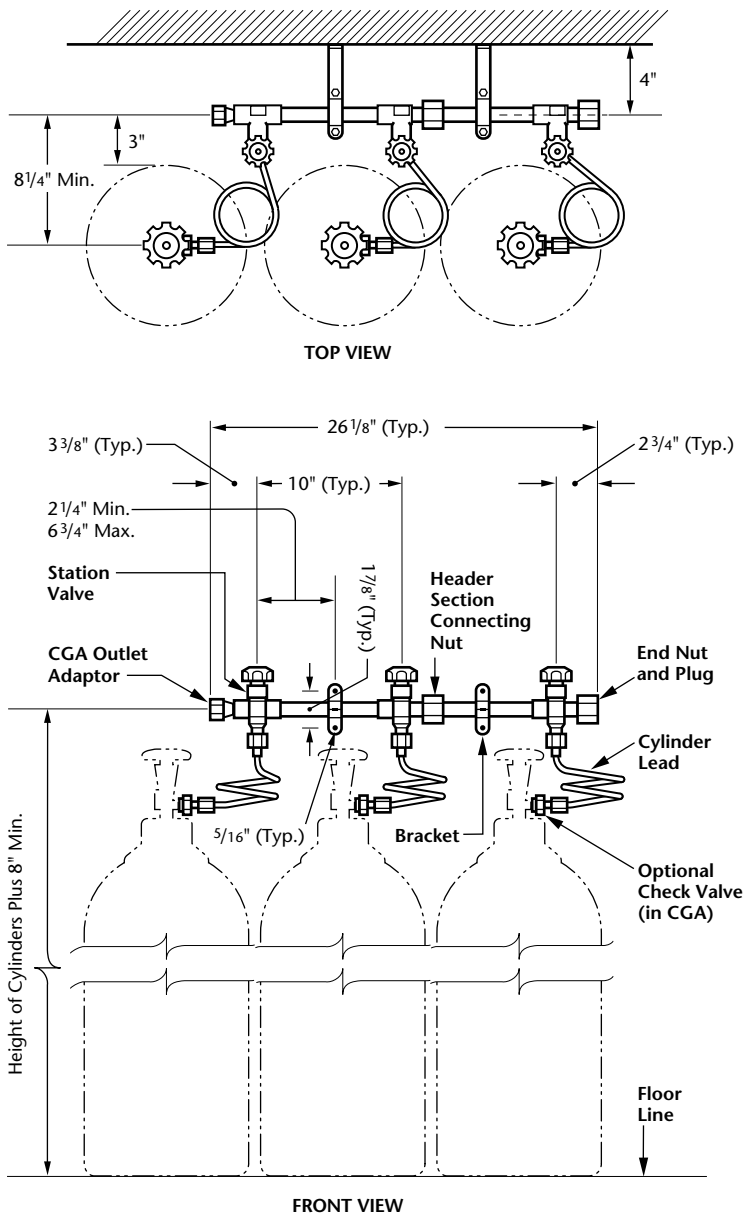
Mounting Dimensions for a Single Row Manifold used on the Right Side of a Changeover Regulator System
